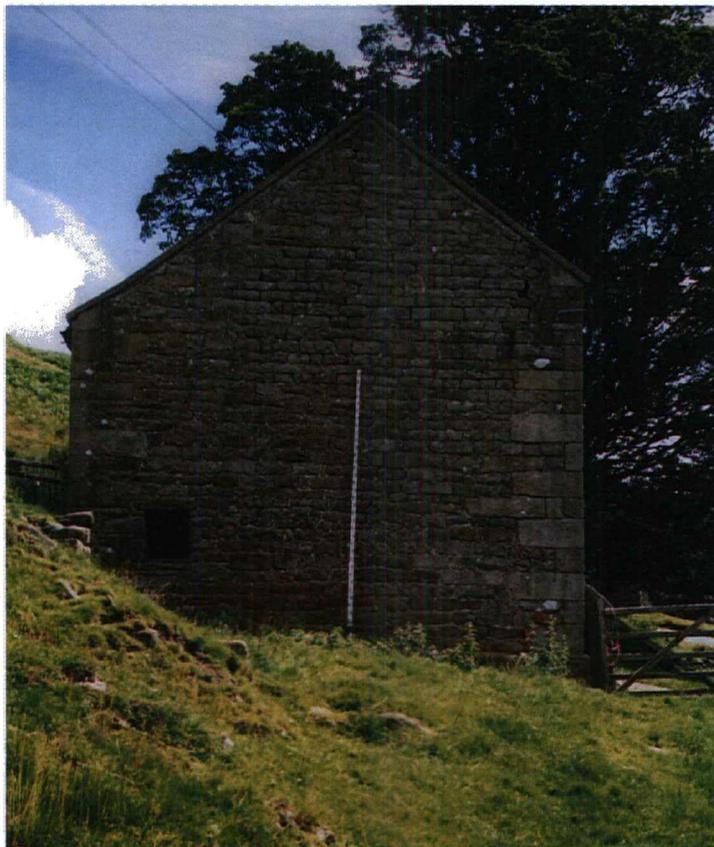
Brackenridge OF, west end, south elevation. The surveying staff used as a scale is extended to 4m.
